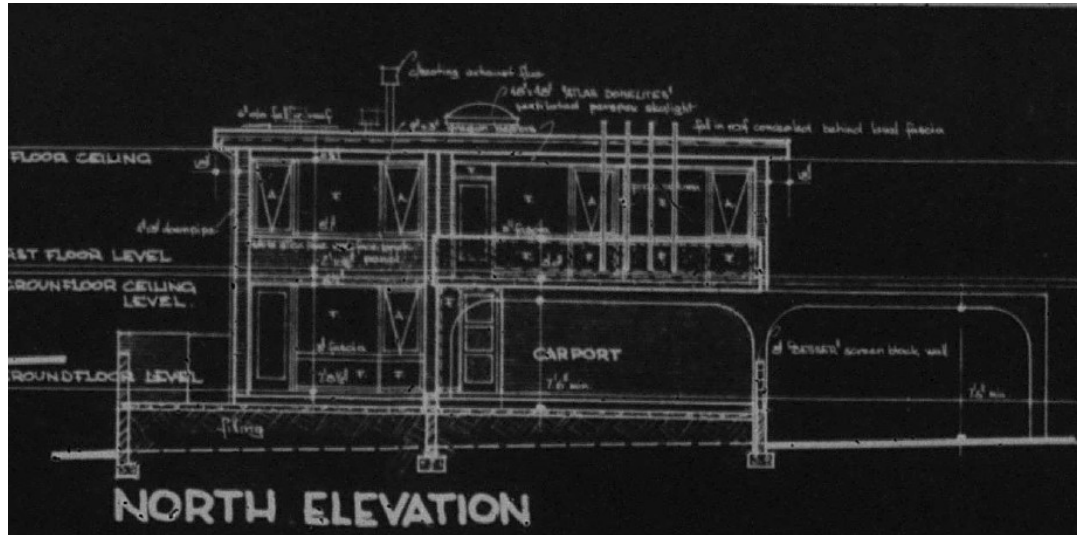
Endorsed building permit plan, showing the final design for the north (front) elevation of 16 Gillard Street. Note the glazed ground-floor door, at left, which has since been altered. (BP 11354/1968)
